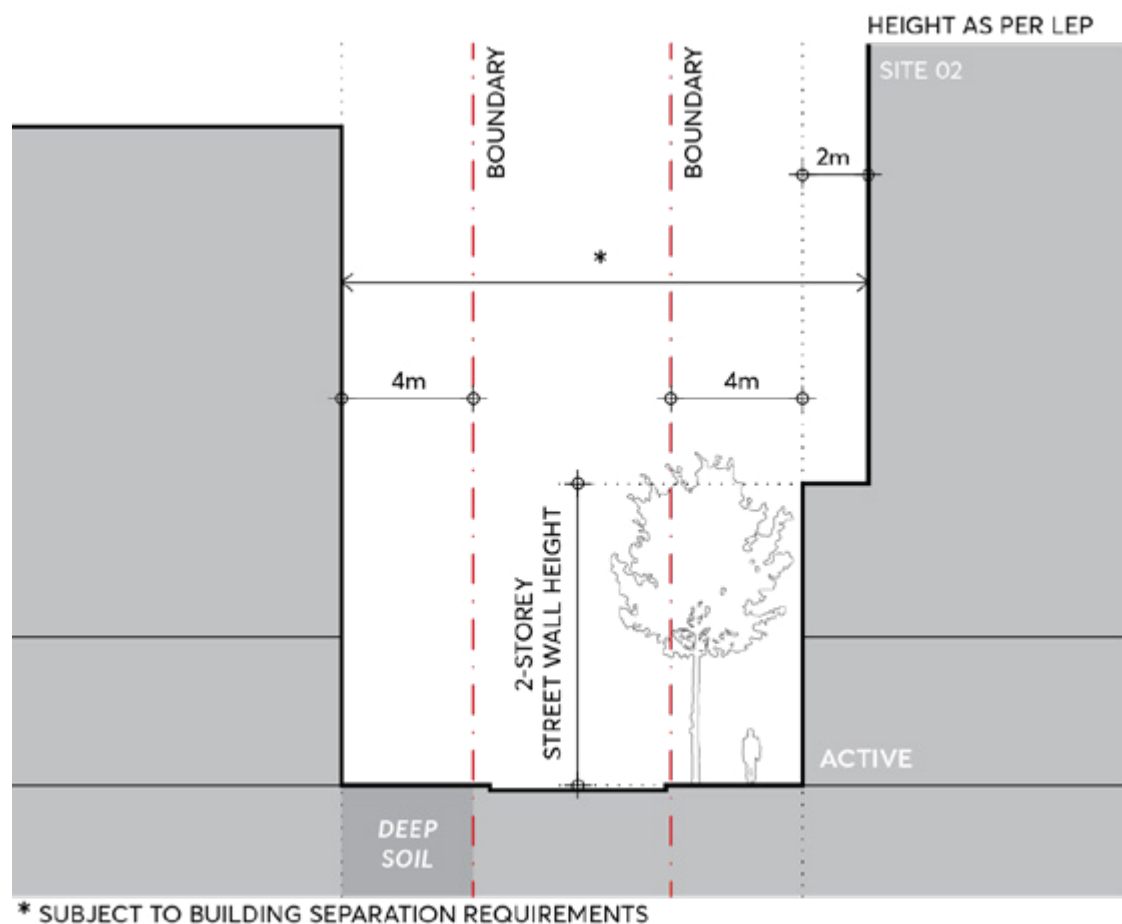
Station Lane (Section D) Setbacks and Street Wall Height
